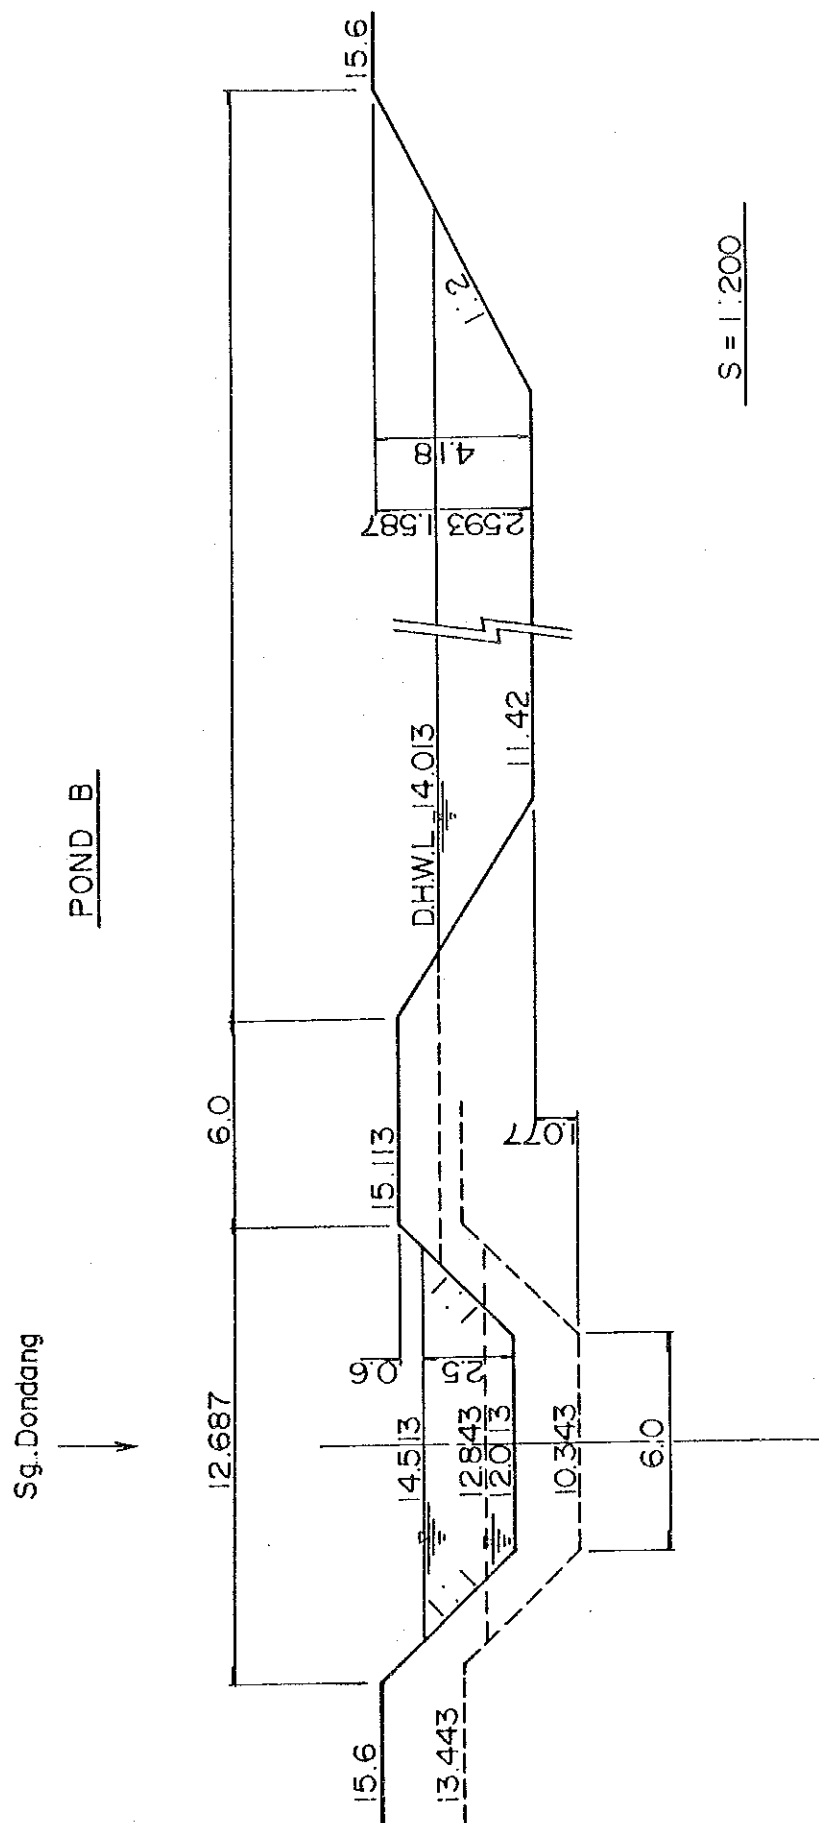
TYPICAL CROSS SECTION OF PROPOSED RETENTION POND B
